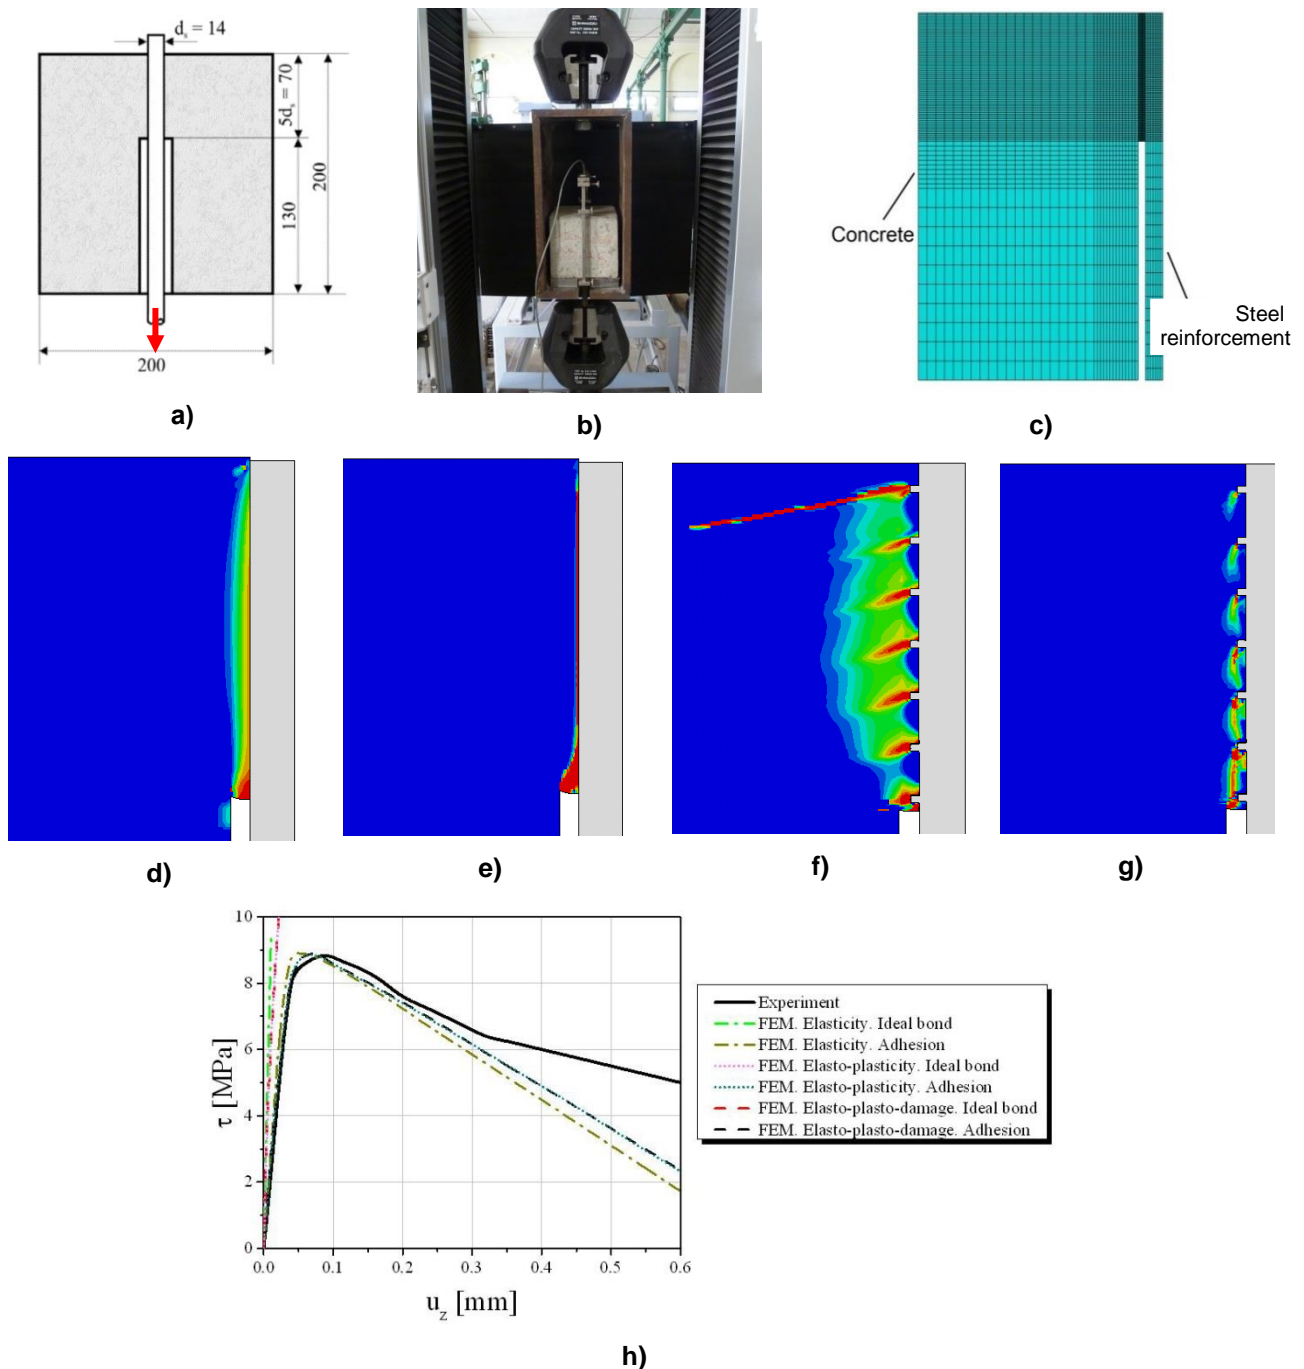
Pull-out test: a) specimen geometry; b) test setup; c) finite-element model; d) damage at tension D_t (model with account of reinforcement ribs); e) damage at compression D_c (model with account of ribs); f) damage at tension D_t (model without account of ribs); g) damage at compression D_c (model without account of ribs); h) shear stress in bond τ vs displacement of reinforcement u_z for various models
